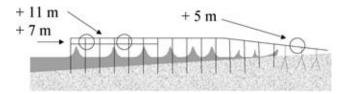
Schematic of Pier Scheveningen; circles indicate test areas on underside of deck; top surface of deck is protected
